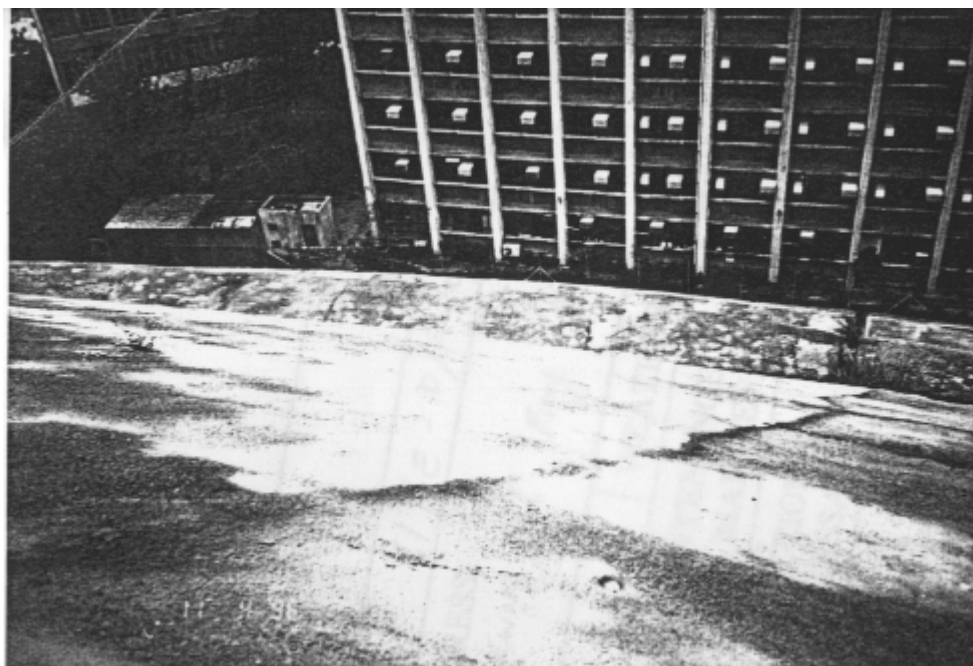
View South-west Down Slope Face From Crest. Note Vertical Line Down Slope Face with Step Across, Indicating Previous Partial Removal of Surfacing Prior to Present Application (Photograph Taken on 11 April 1996)
